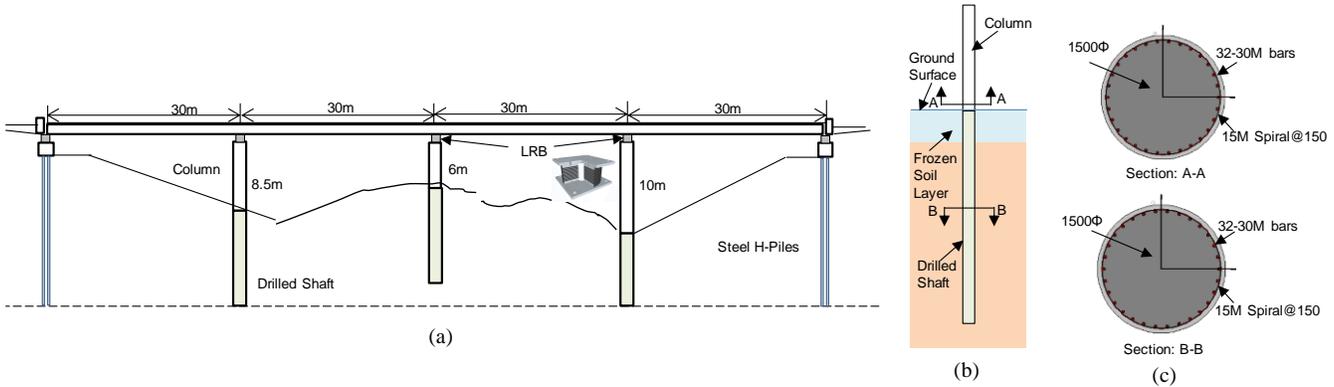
(a) Elevation of the bridge studied, (b) Details of the soil-foundation system, (c) cross section of column and drilled shaft
